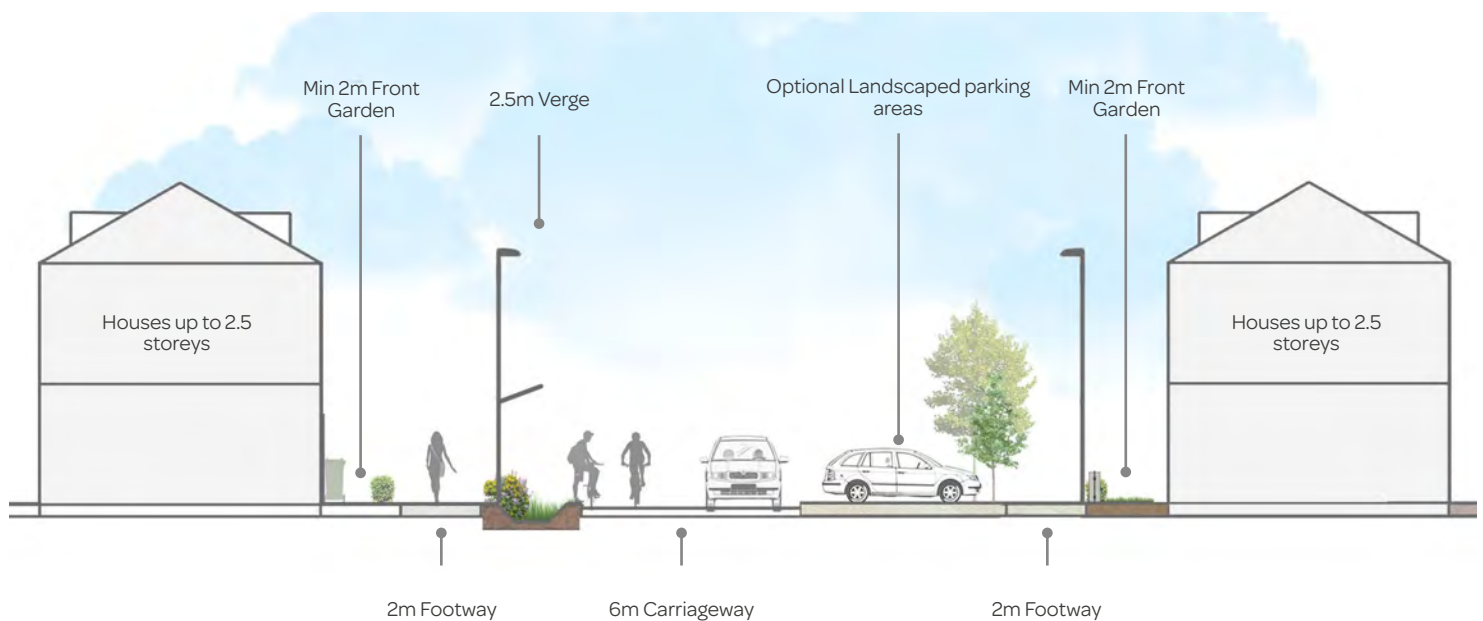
Indicative Street Section - Primary Street with Rain Garden
